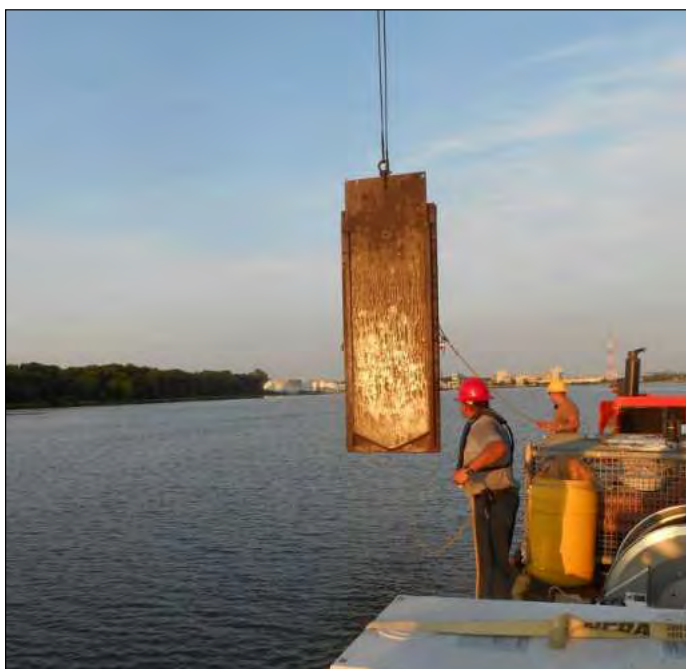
7-ton sectioning blade and guide being lowered into position.
